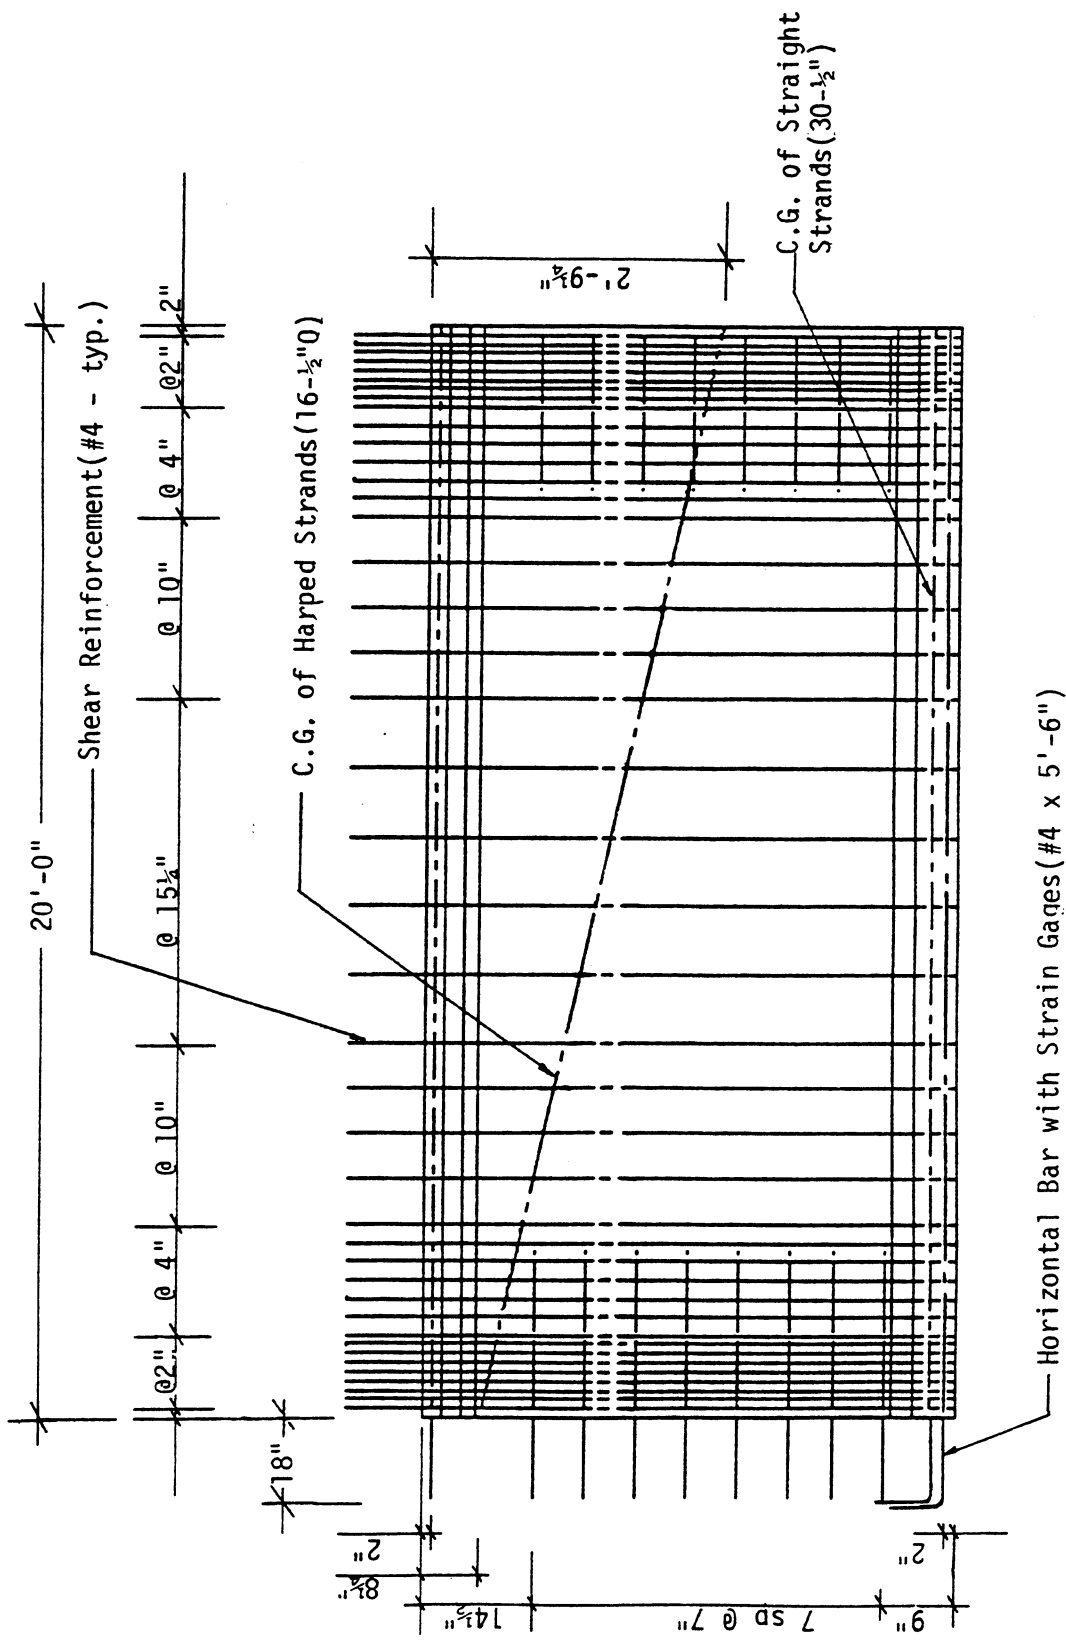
Laboratory Test - Longitudinal Section of a Test Girder
